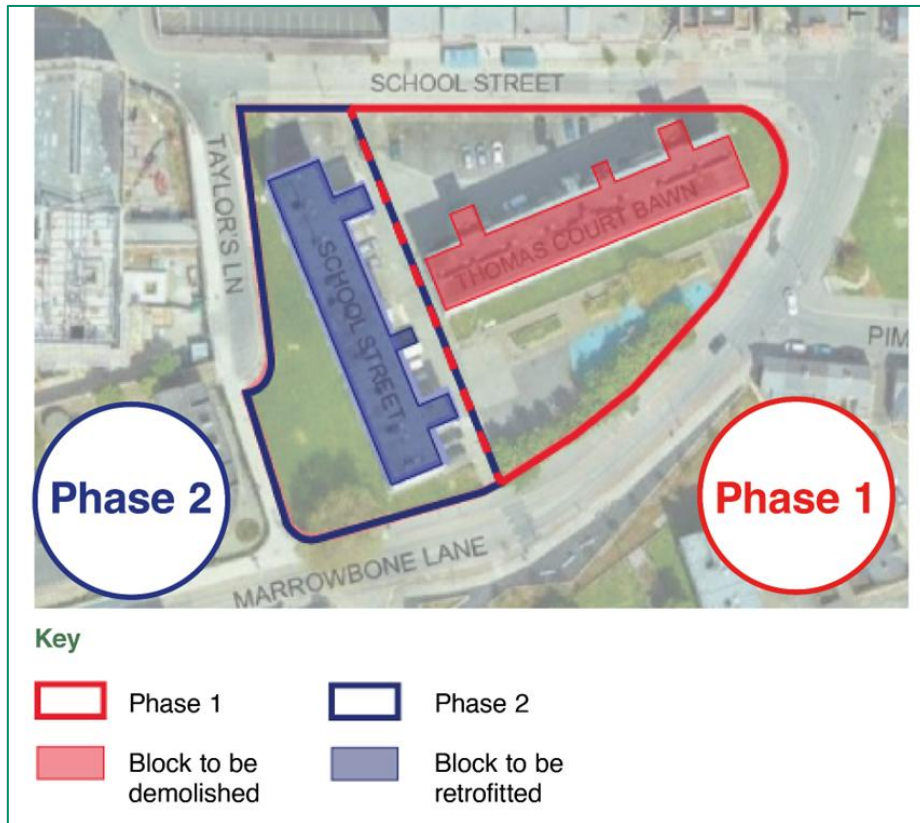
Proposed Development Phasing (Source: Metropolitan Workshop)
